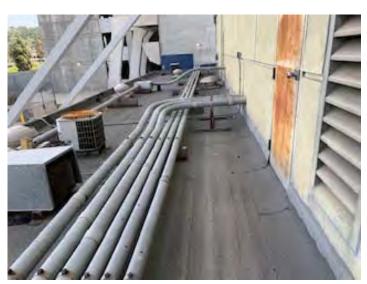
ACM: Rolled roofing on scoreboard building roof on Plaza level.
